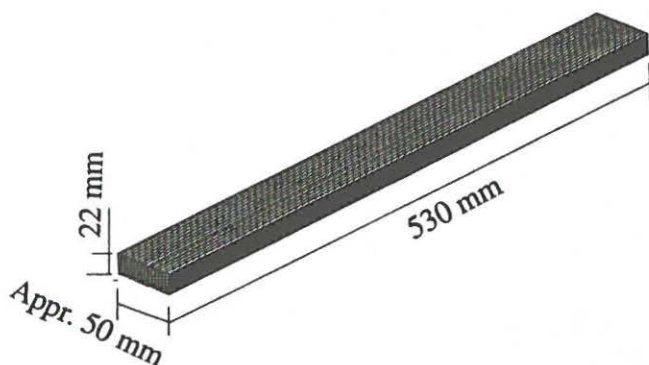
Test pieces for duration of load and creep test for edgewise bending
